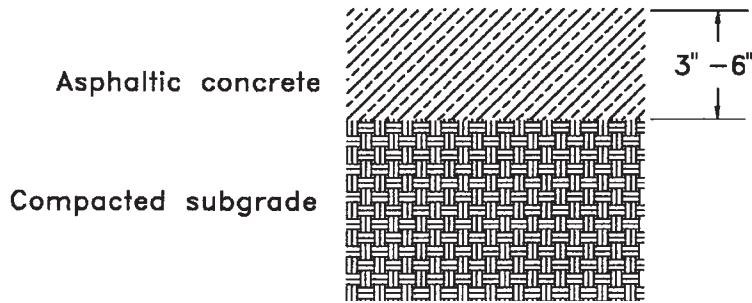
Asphalt concrete bike route surface detail (no base).
